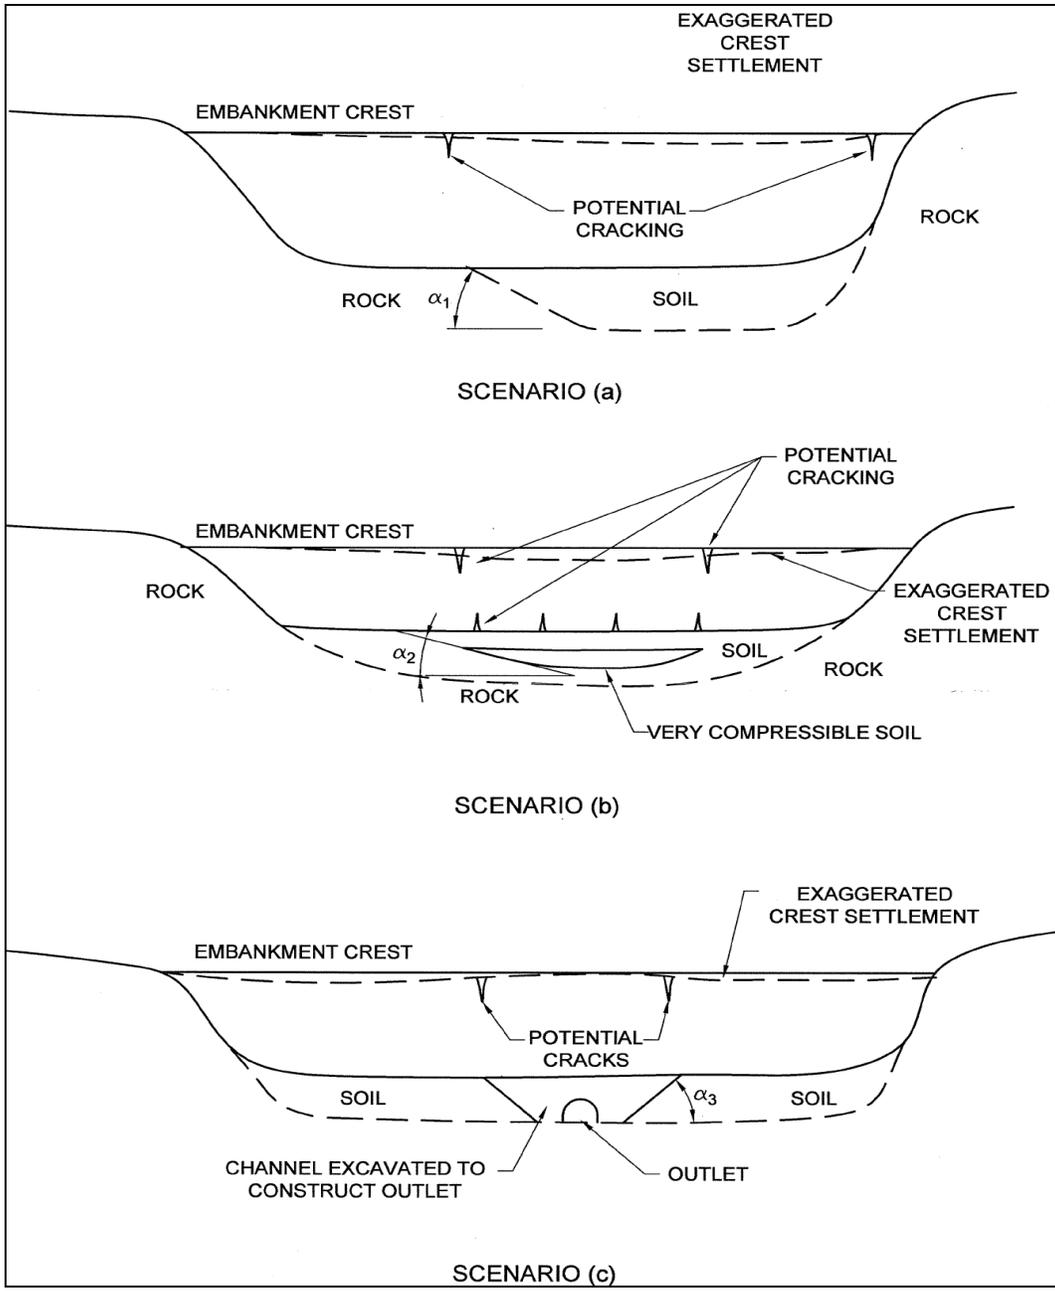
B-5. Cracking and Hydraulic Fracture due to Differential Settlement in the Foundation (Fell et al. 2008)
